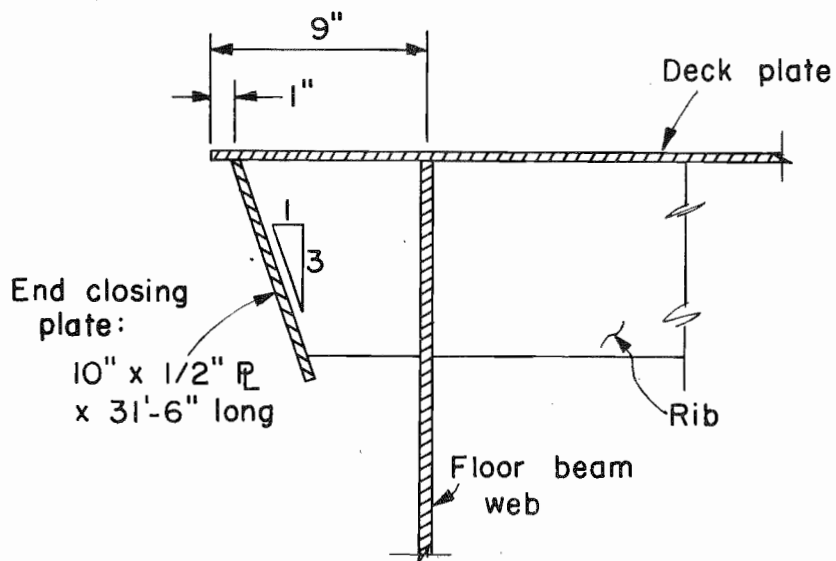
CROSS SECTION AT END OF BRIDGE.
